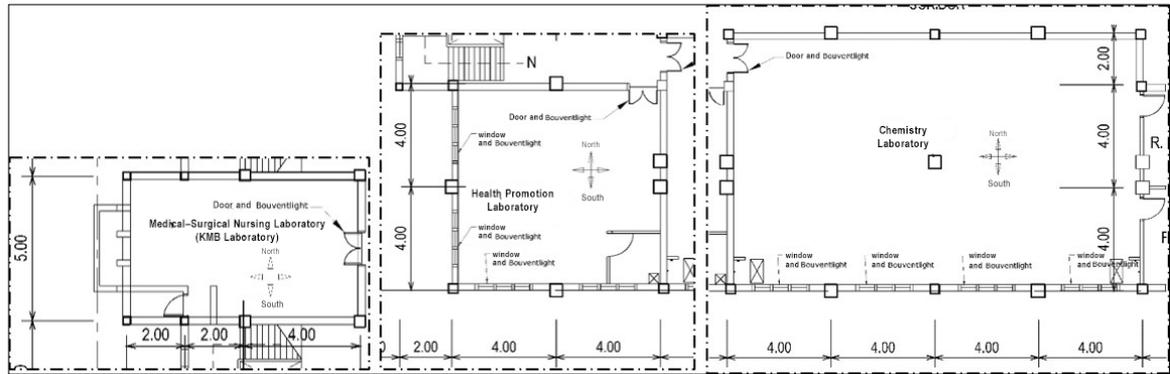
Layout Plan of the Measured Laboratory Room 2
